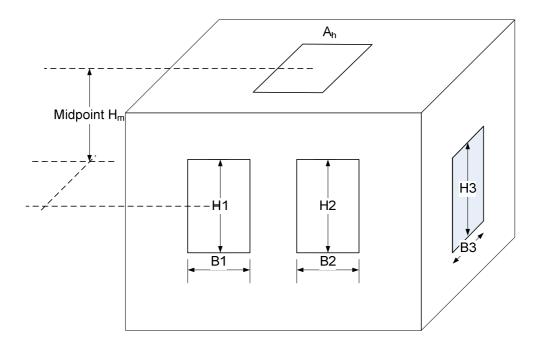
Single firecell structure with 3 windows and 1 roof vent
